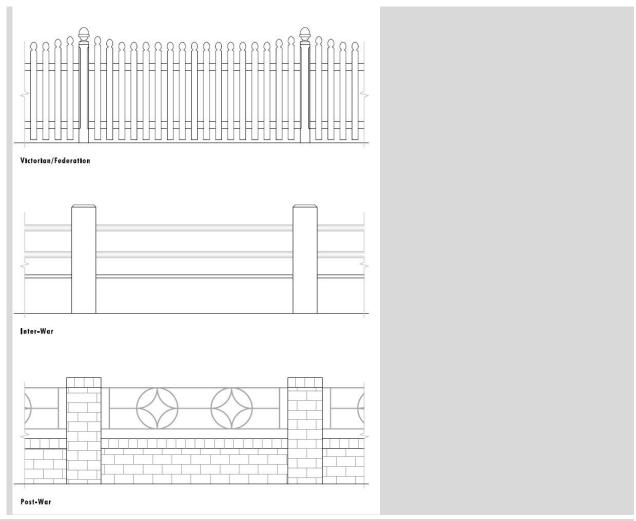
Illustration of typical fence styles referred to in this area plan
